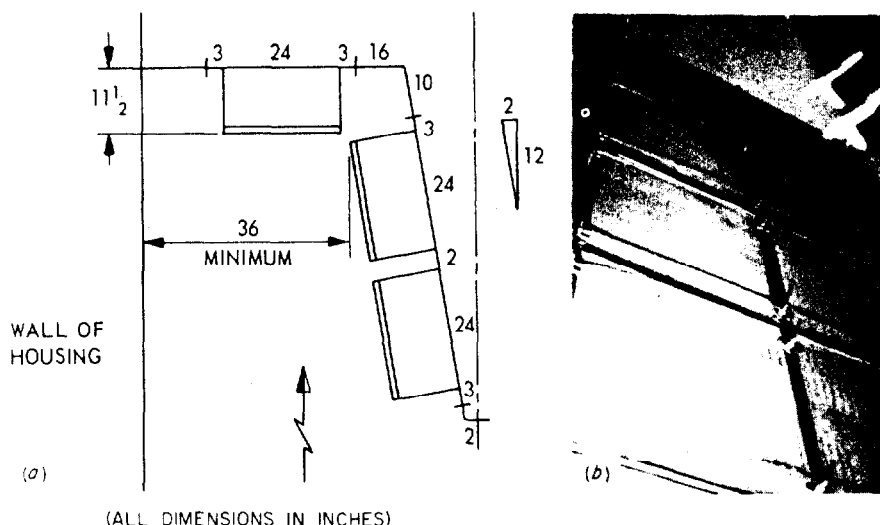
Layout of U- and V-banks. (a) Recommended dimensions for laying out a U-shaped or V-shaped filter bank. (b) Poorly laid out V-bank. Note inadequate working space at apex of bank, 5-high filter layout with no service gallery, and minimal spacing of filters on the mounting frame.
